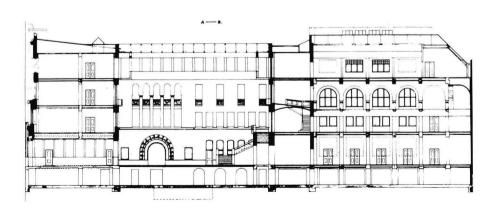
The Helsinki Stock Exchange building, longitudinal section towards south, main drawings, 1910. (HKRVVA).
